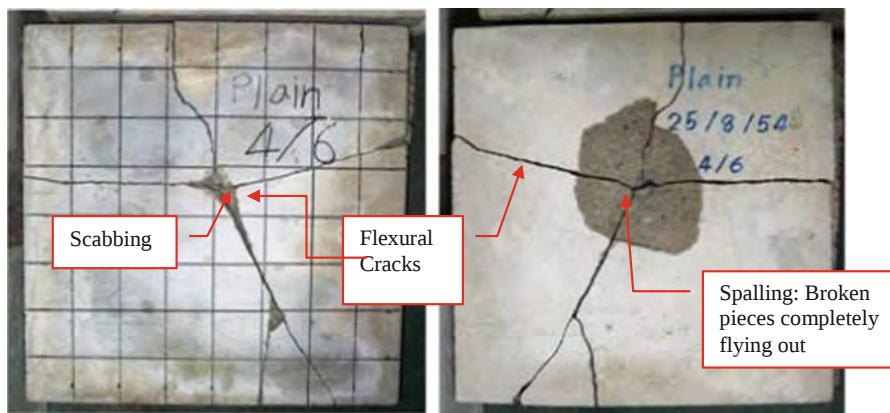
Failure patterns of single layer plain concrete panel
